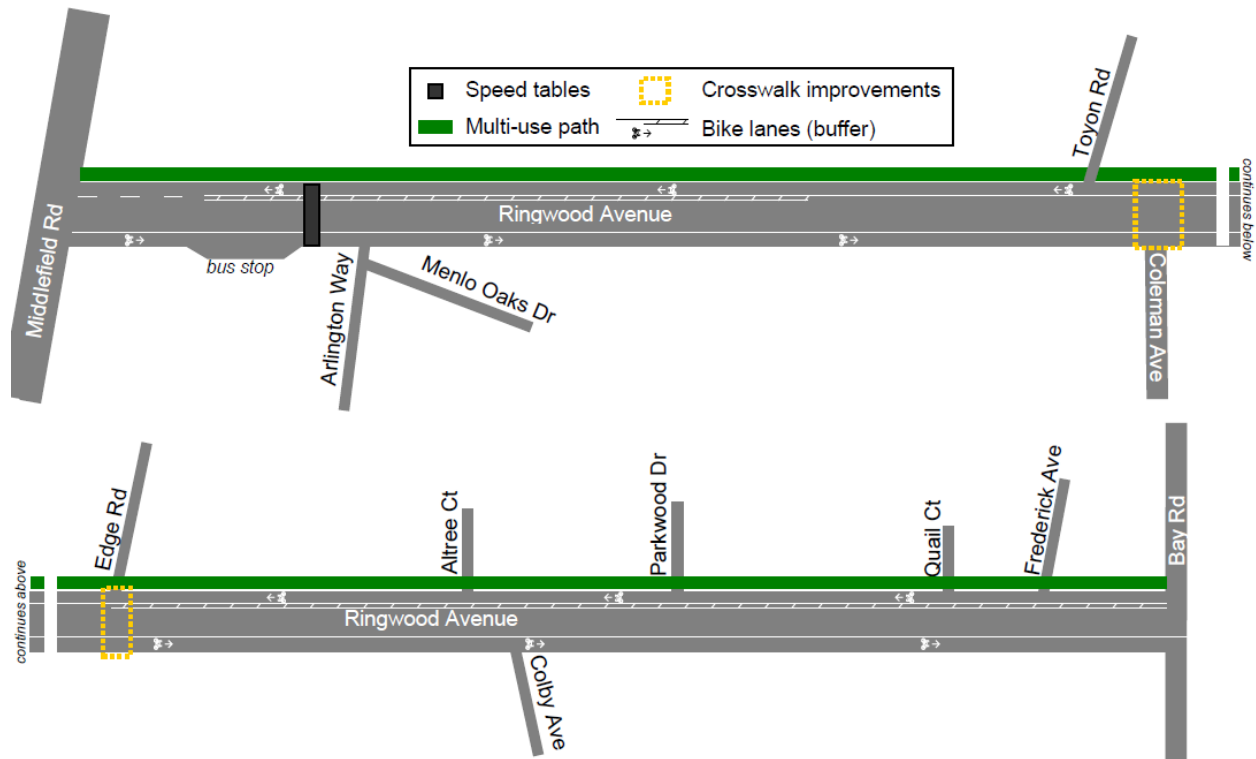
Ringwood Avenue Long-term Alternative Plan View Schematic Bike Lanes (Protected near Schools) with Off-street Pathway
